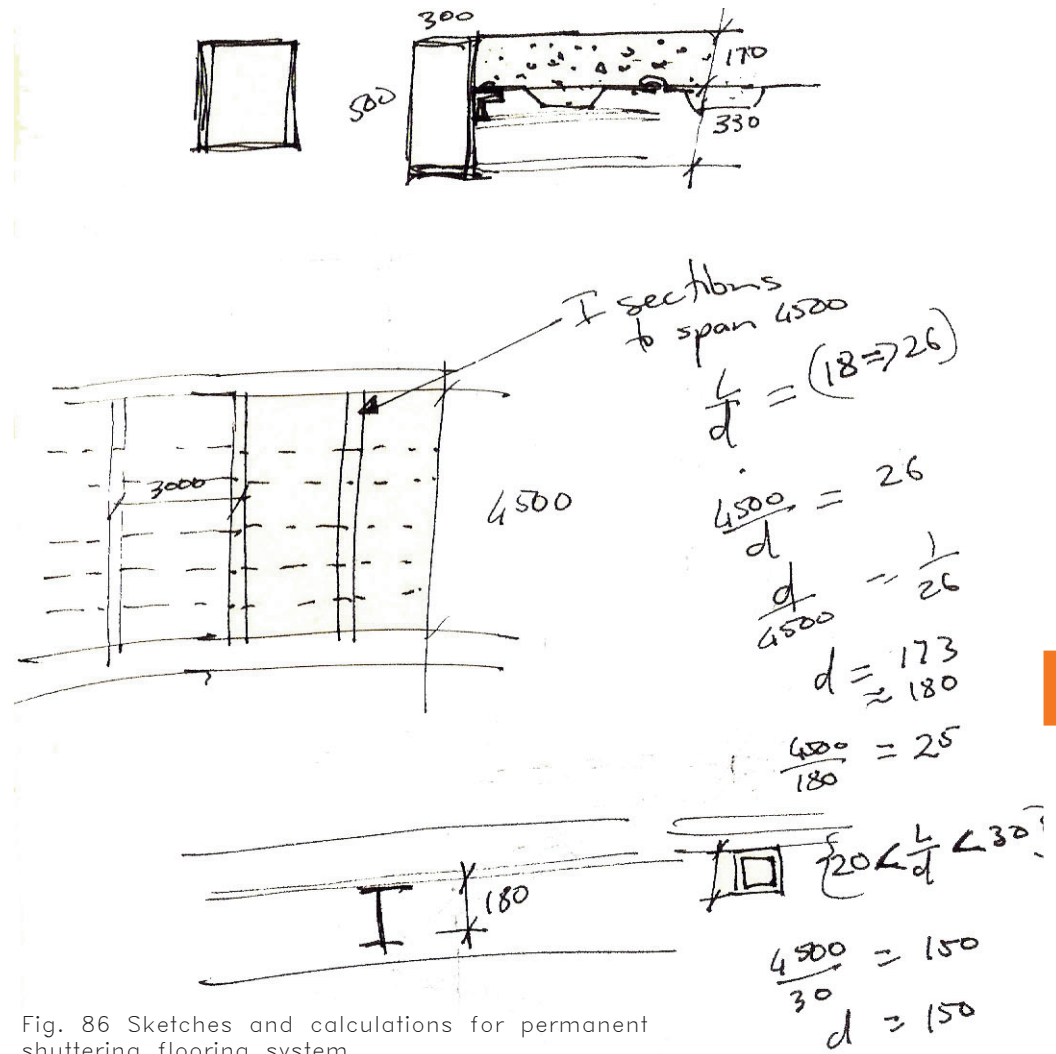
Sketches and calculations for permanent shuttering flooring system
